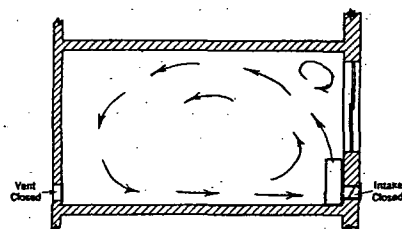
SECTION THROUGH A UNIT CONDITIONER EQUIPPED ROOM WHEN COOLING
